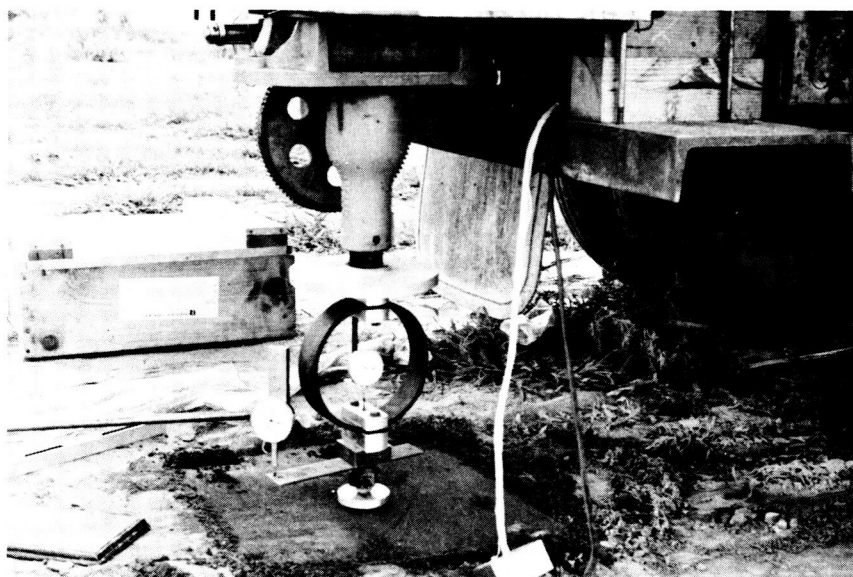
TEST SETUP SHOWING CHANNELS, MOTOR, JACK, PROVING RING, EXTENSOMETER, PLATE, AND TRUCK
